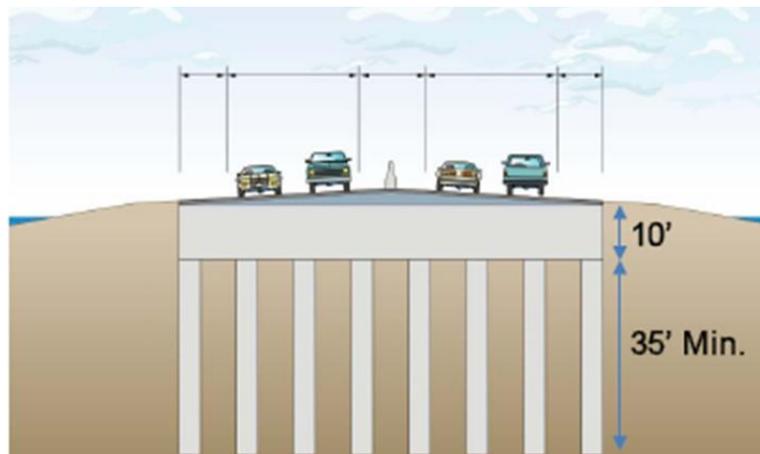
Combination of deep and shallow soil mixing used to stabilize causeway.
